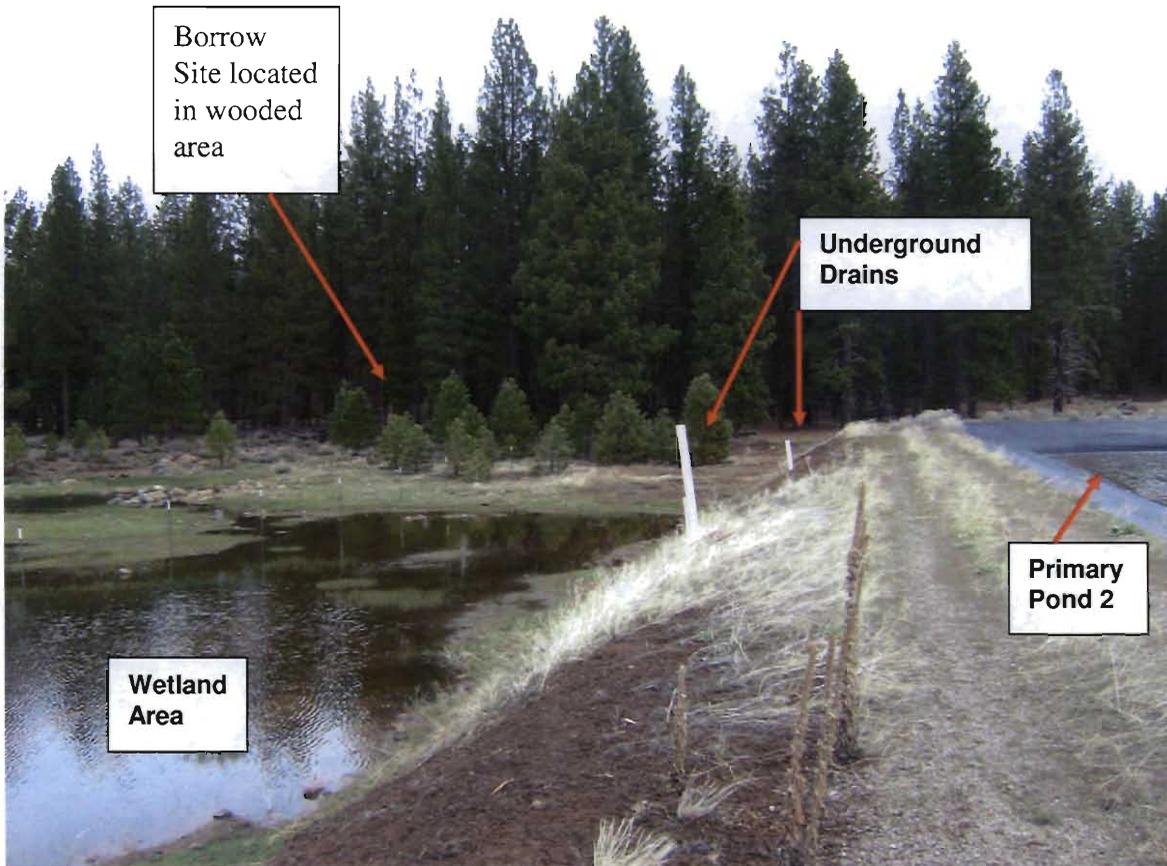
Eagle Lake Wastewater Facility – Looking north along the western edge of Primary Pond 2. Wetland and underground pond drains visible. The expanded evaporation pond would extend to the photographer’s left. (Taylor Zentner, 05-01-09, Sony Cybershot camera)
